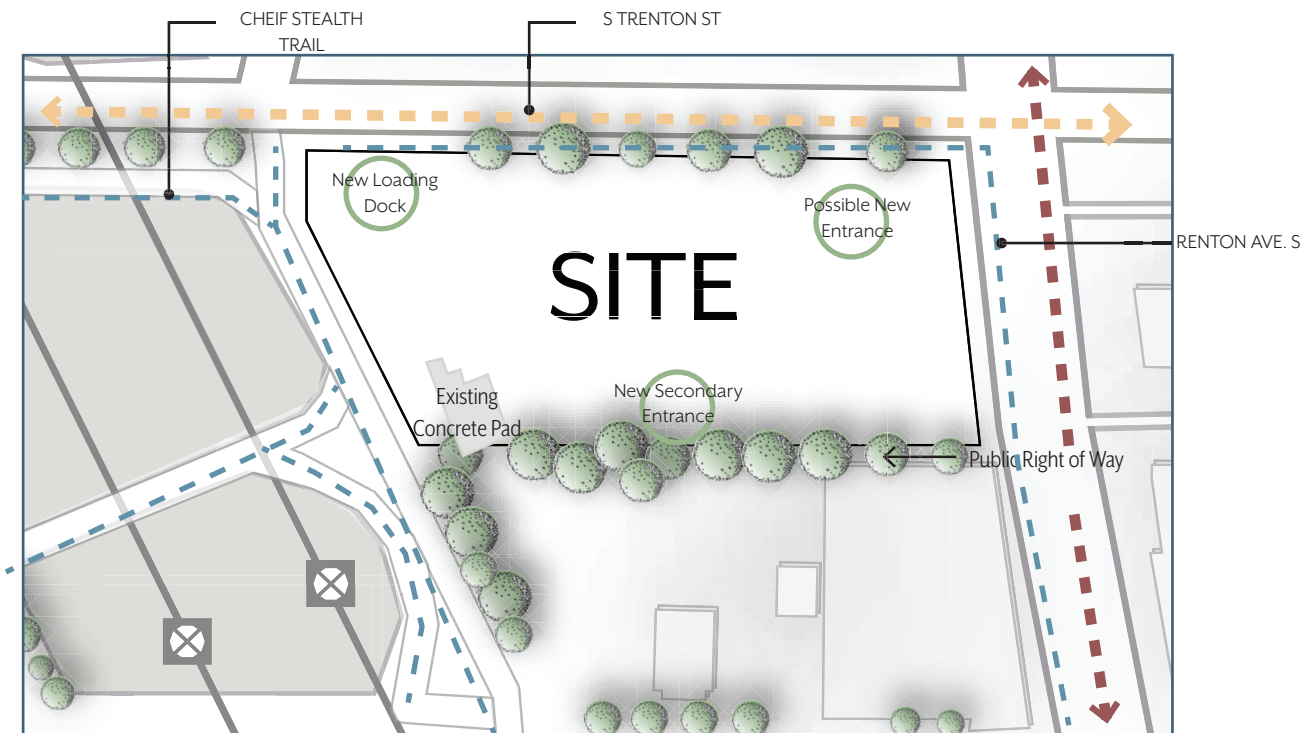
SITE TRAFFIC — Minor Road — Major Road — Pedestrian Route
